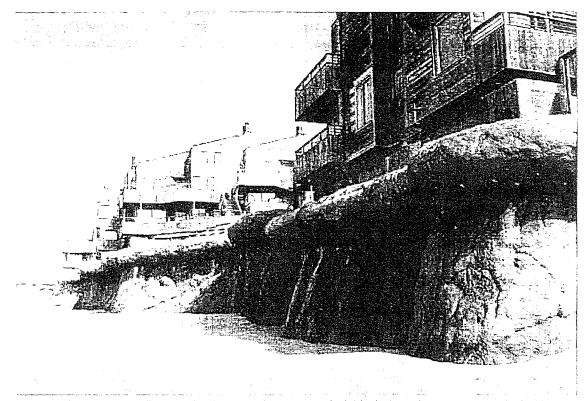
Concrete seawall protecting Ocean Harbor House, which blocks lateral beach access at high tides.
